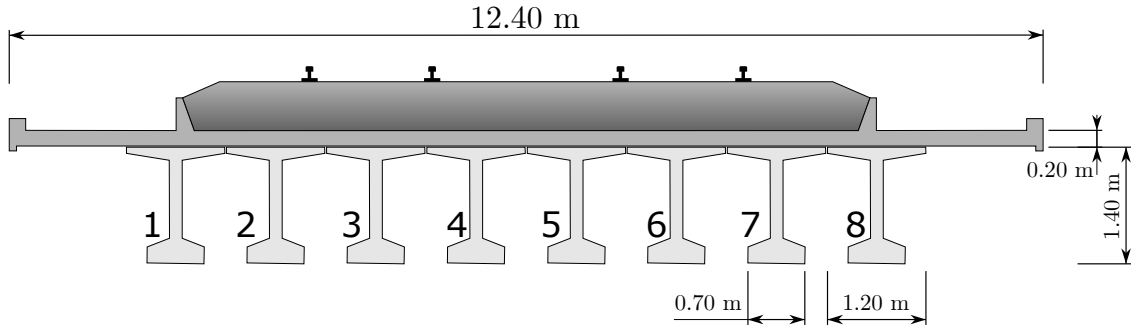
Orte-Falconara bridge case study: cross-section details with beams numbering.
